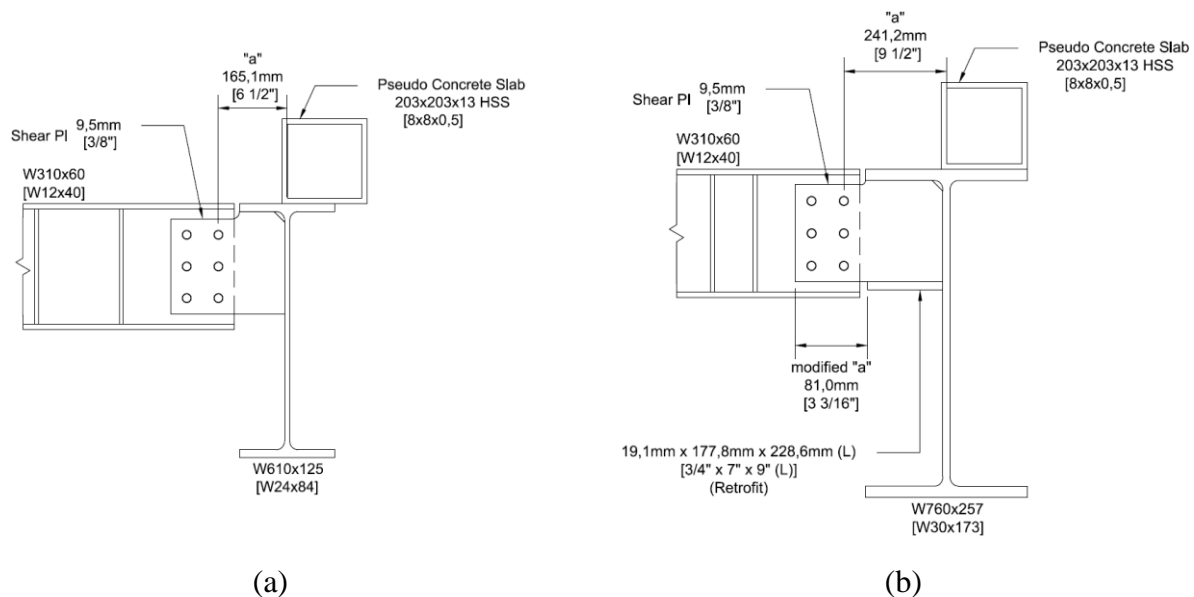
Extended shear tab partial depth (a) Specimen 6J, (b) Specimen 9J
